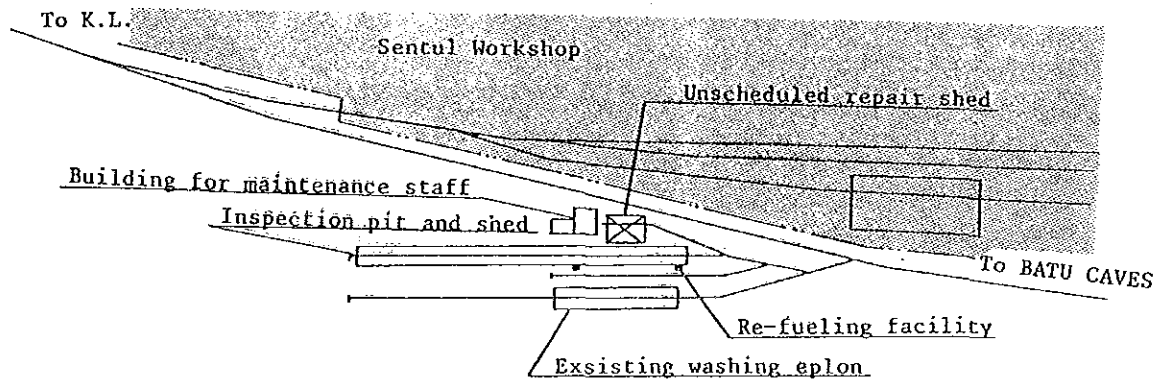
Equipment Layout of DMU Depot (1/2)
